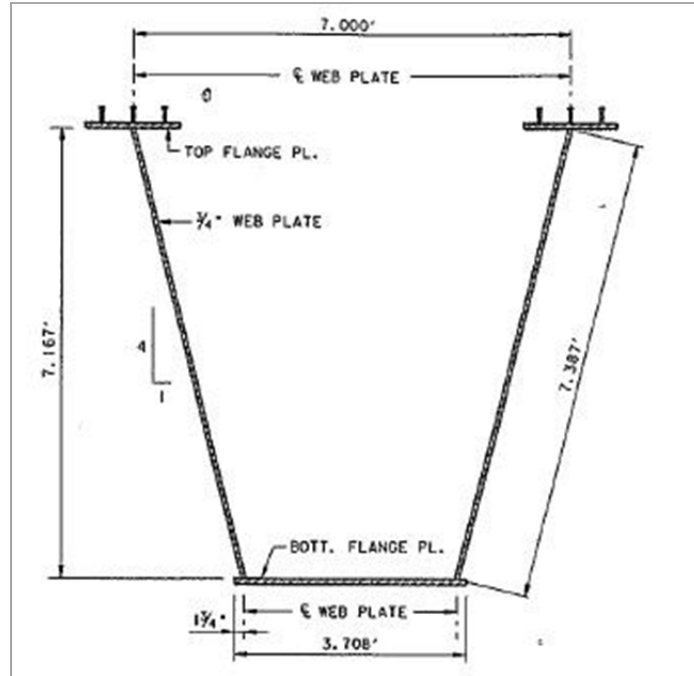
Typical cross-section of the steel girder of the Woodway Bridge span 11
